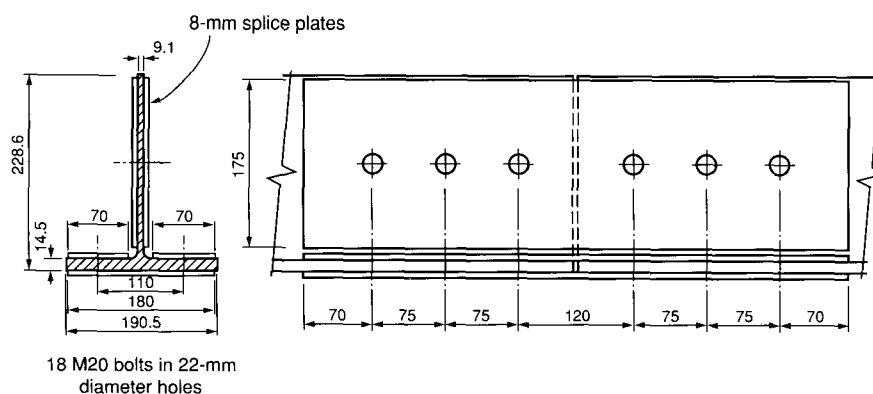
Detail of splice showing bolting arrangement (dimensions in mm)
